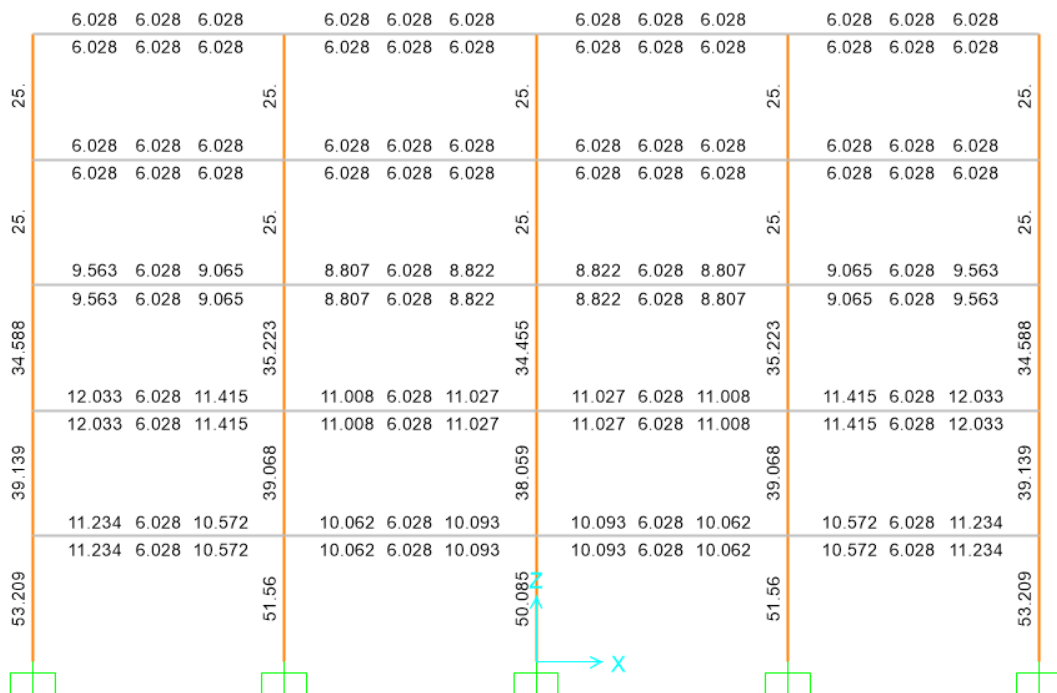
Rebars required in the central longitudinal frame, applying the seismic load combination.
